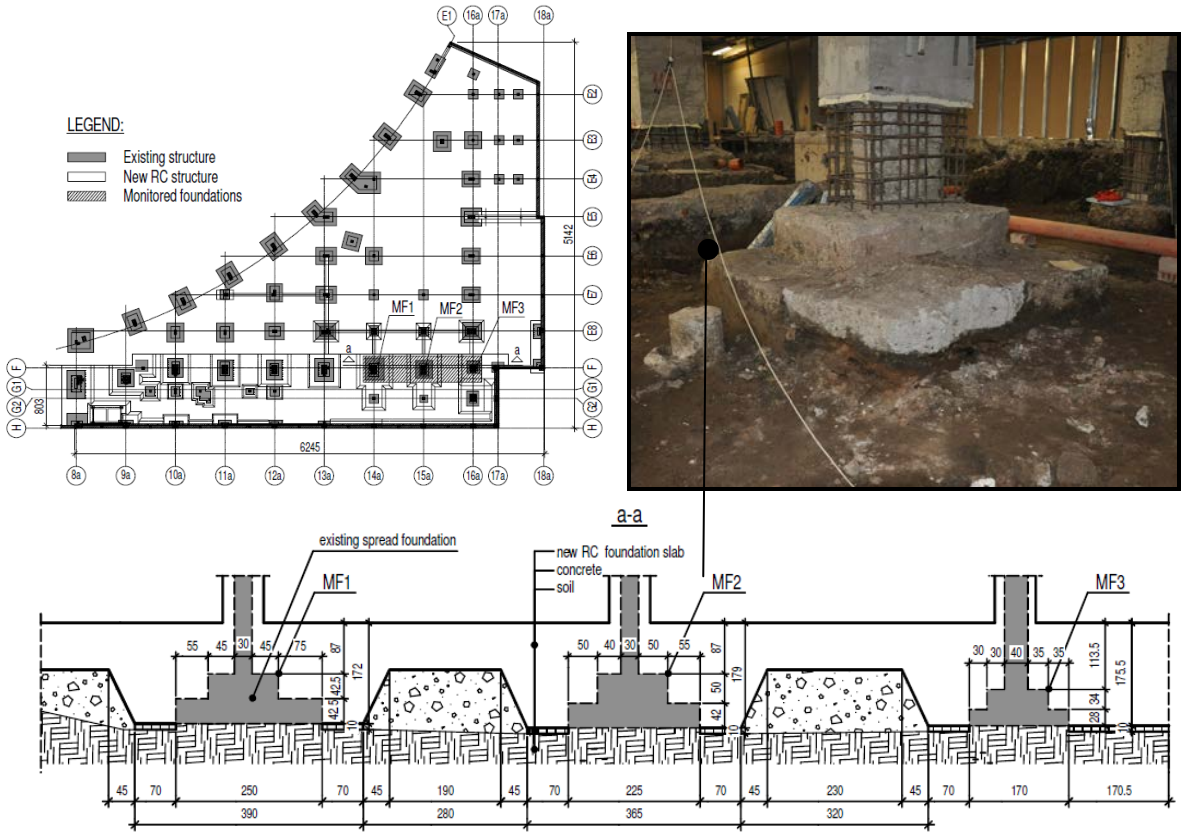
Foundation plan of the RC slab and a section showing the monitored foundations (unit – cm).
